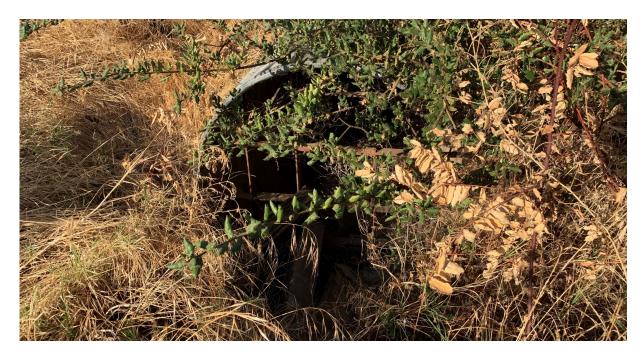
View of culvert at west end of the Area of Interest near fence line shown on Photo 2
